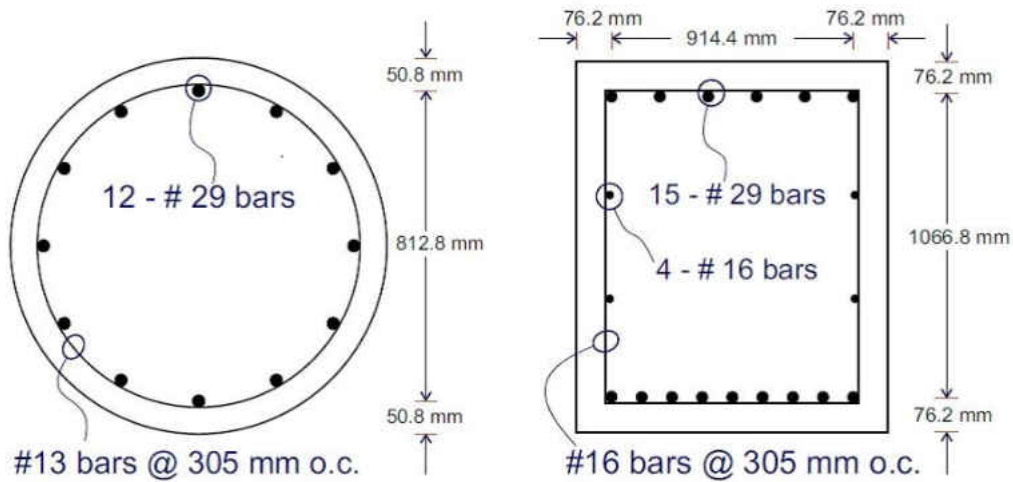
Reinforcing layouts for concrete beam and bent cap
